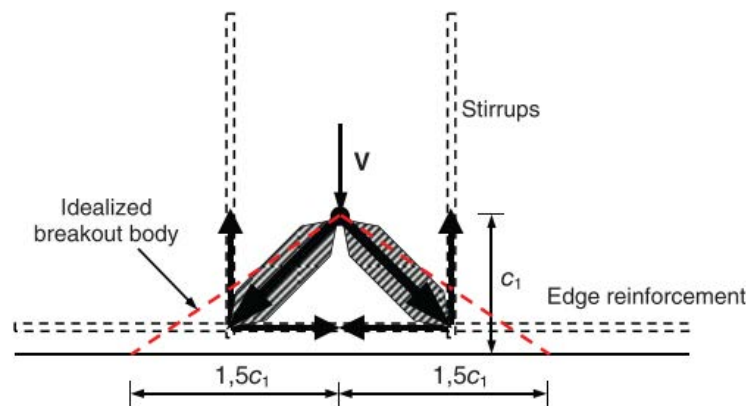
Strut-and-tie model for anchors with reinforcement close to an edge (Sharma et al. 2016)
